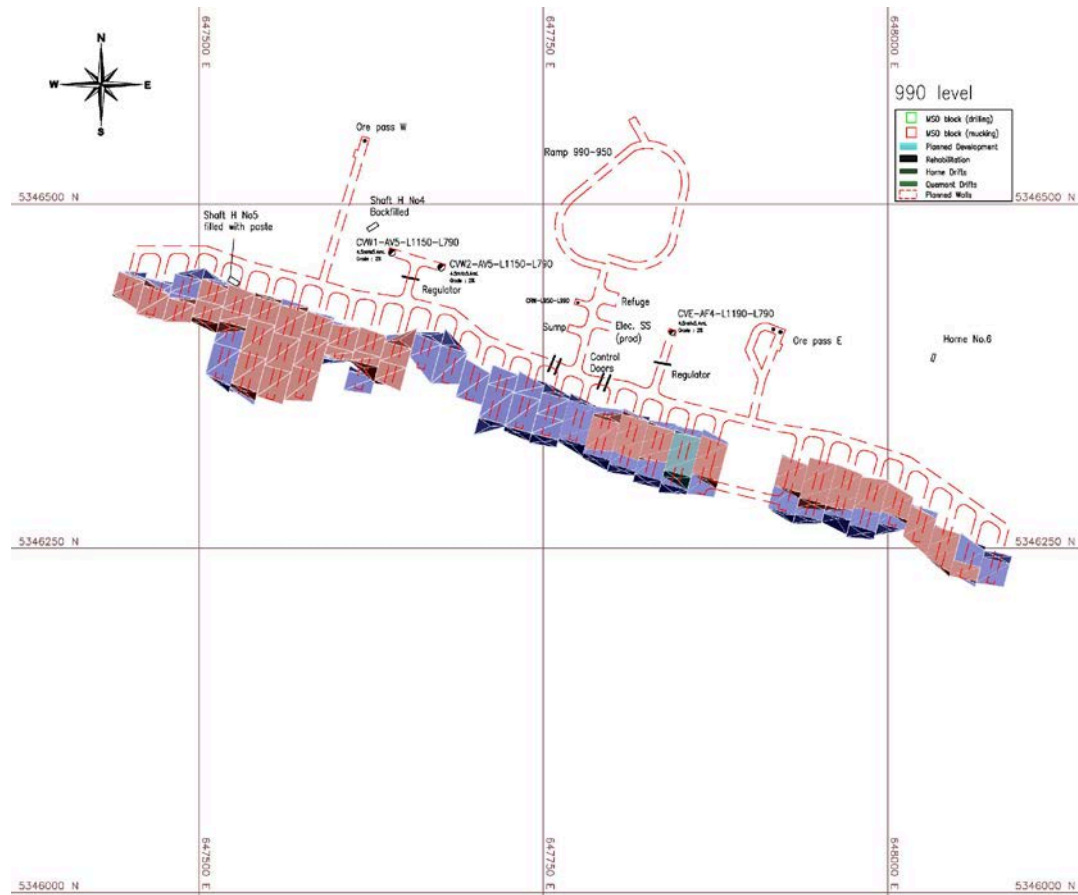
Typical production level – general arrangement with refuge and level in waste
